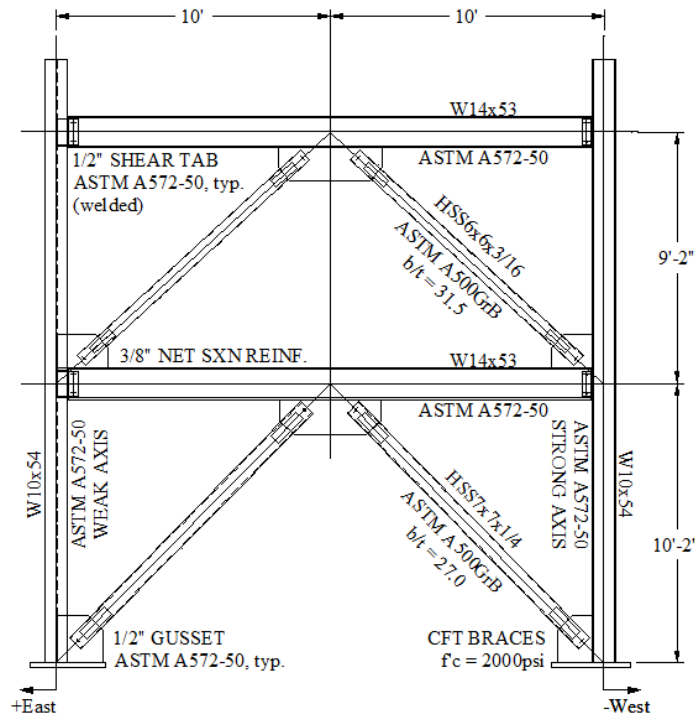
Test specimen schematic with dimensions, materials, and member sizes: NCBF-B-2.
